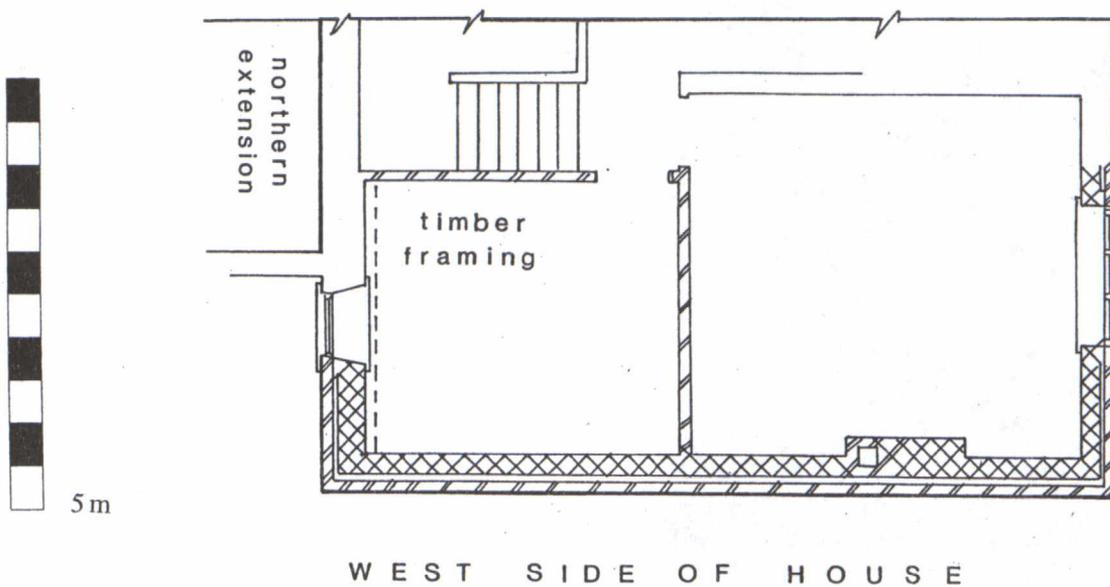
Plan of the 18th-century and earlier house showing the location of the timber framing.
